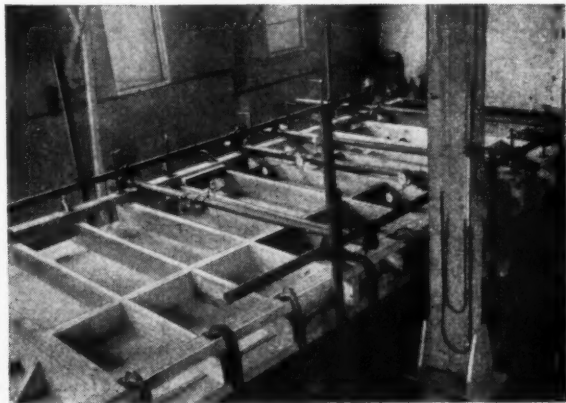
Rig for static loading tests. (Floor section is inverted, with captive airbag beneath for loading.)
